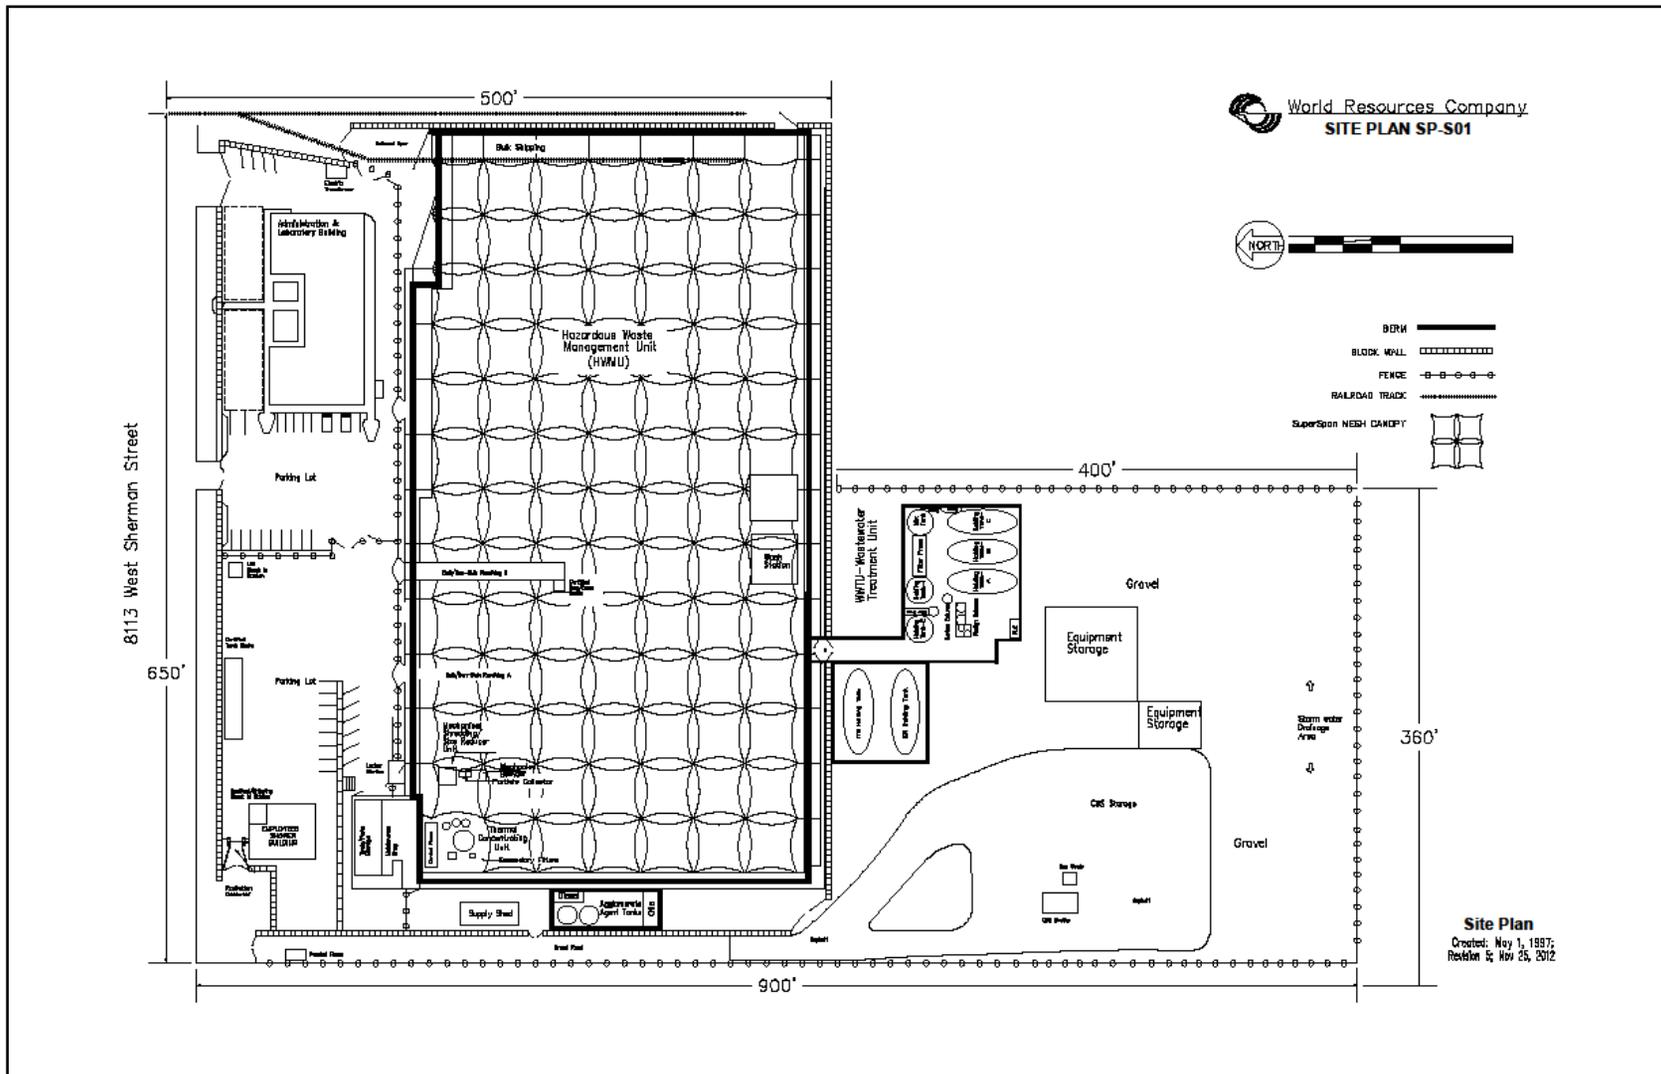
Facility Plan for World Resources Company in Tolleson, Arizona.
